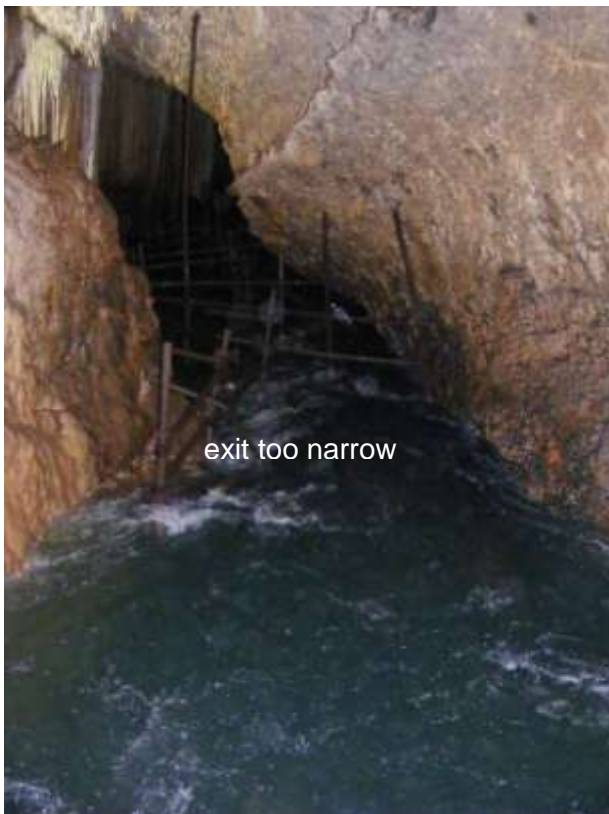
Narrow Passage between Boat Mooring and Inner Dam
